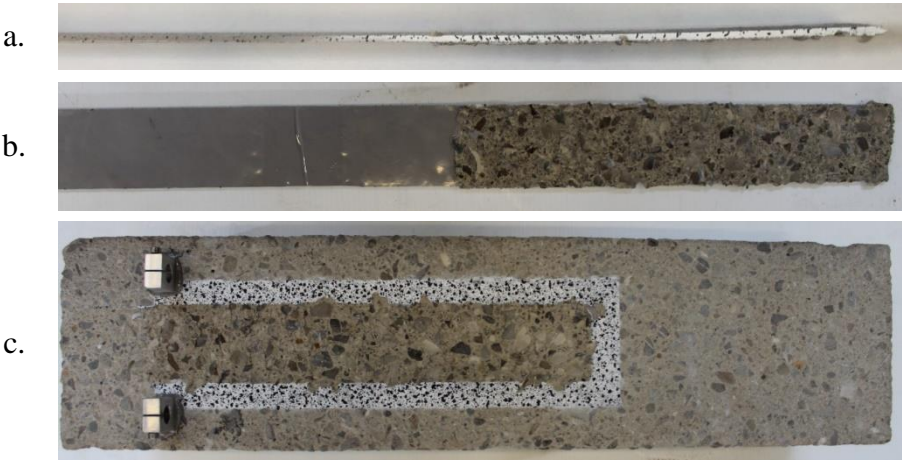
Failure mode for specimen DS_300_50_UHD_D_B_4: a) Side view of the SRP strip; b) Fracture surface on the SRP strip; c) Concrete substrate.
